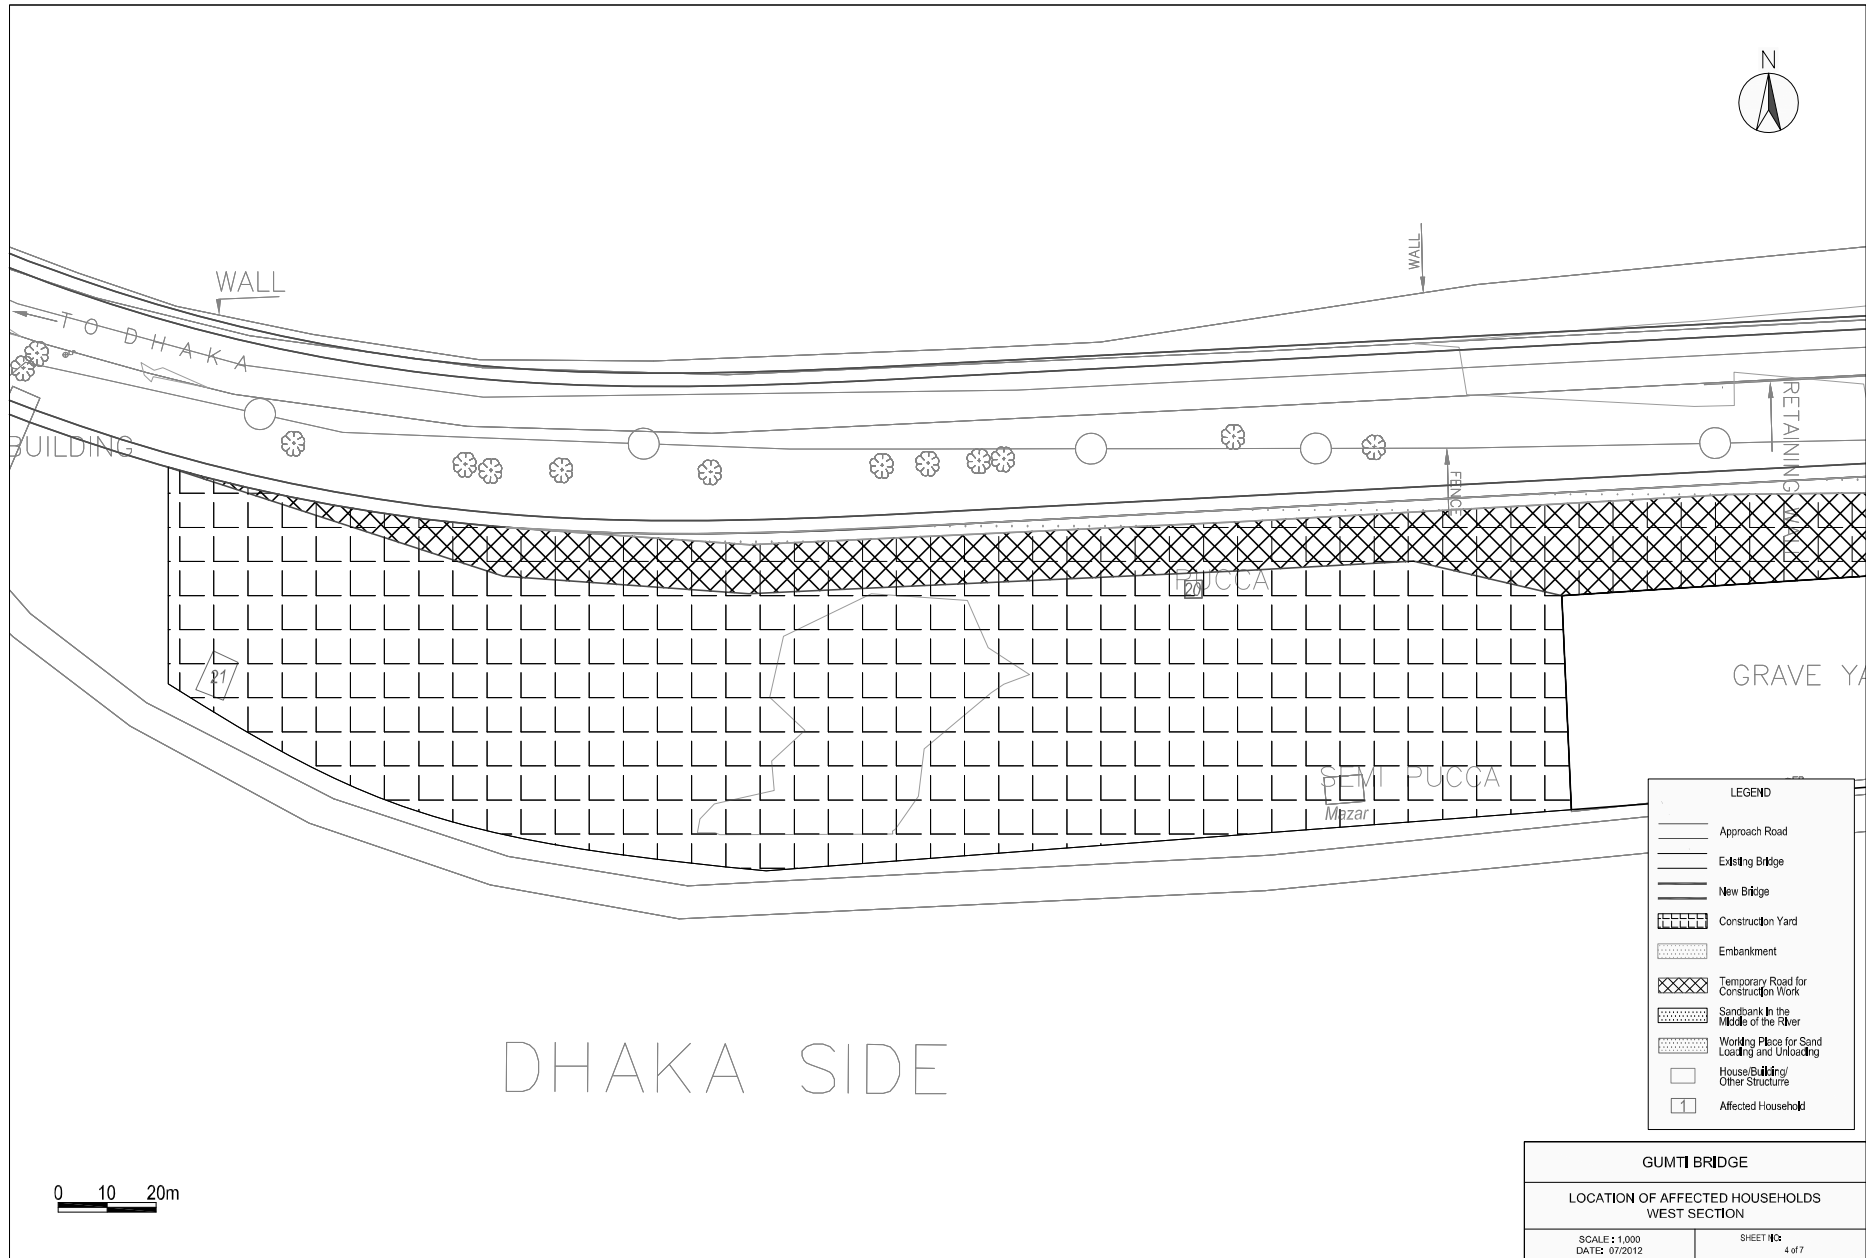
Location of Affected Households West Section (Sheet No. 4)
